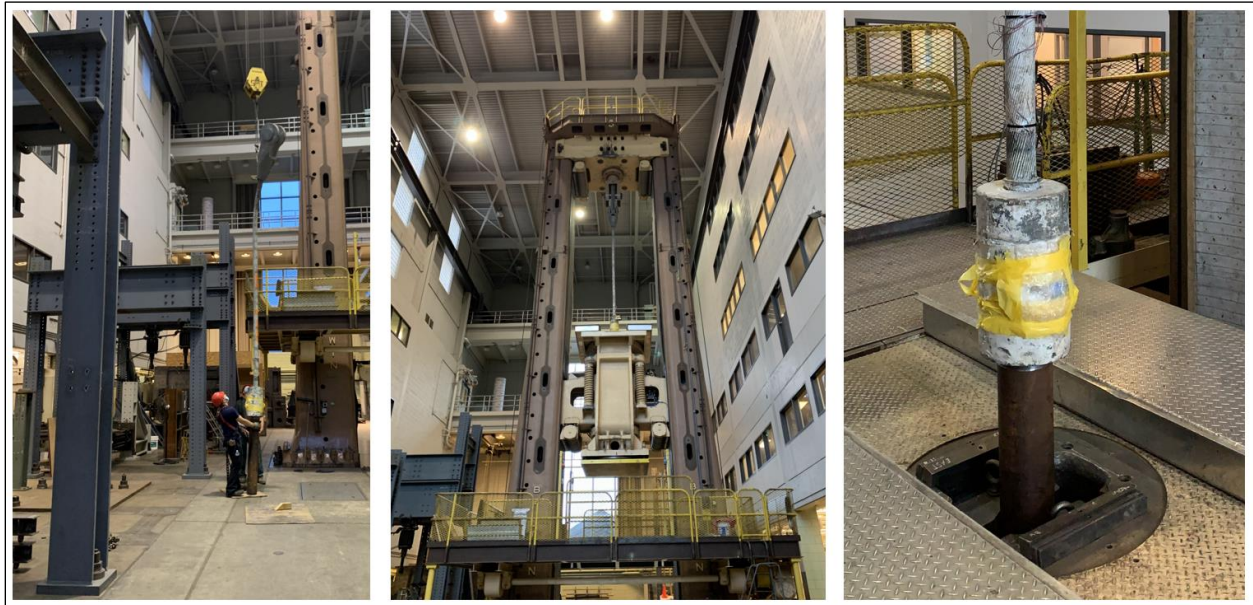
Cable test at Fritz Laboratory using a 5,000-kip universal testing machine.
